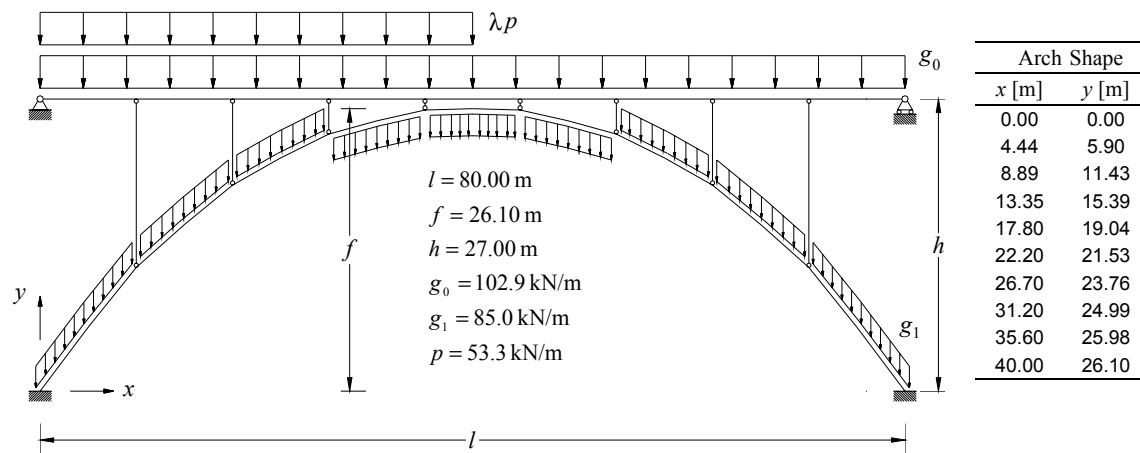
STRUCTURAL MODEL OF THE ARCH BRIDGE.
